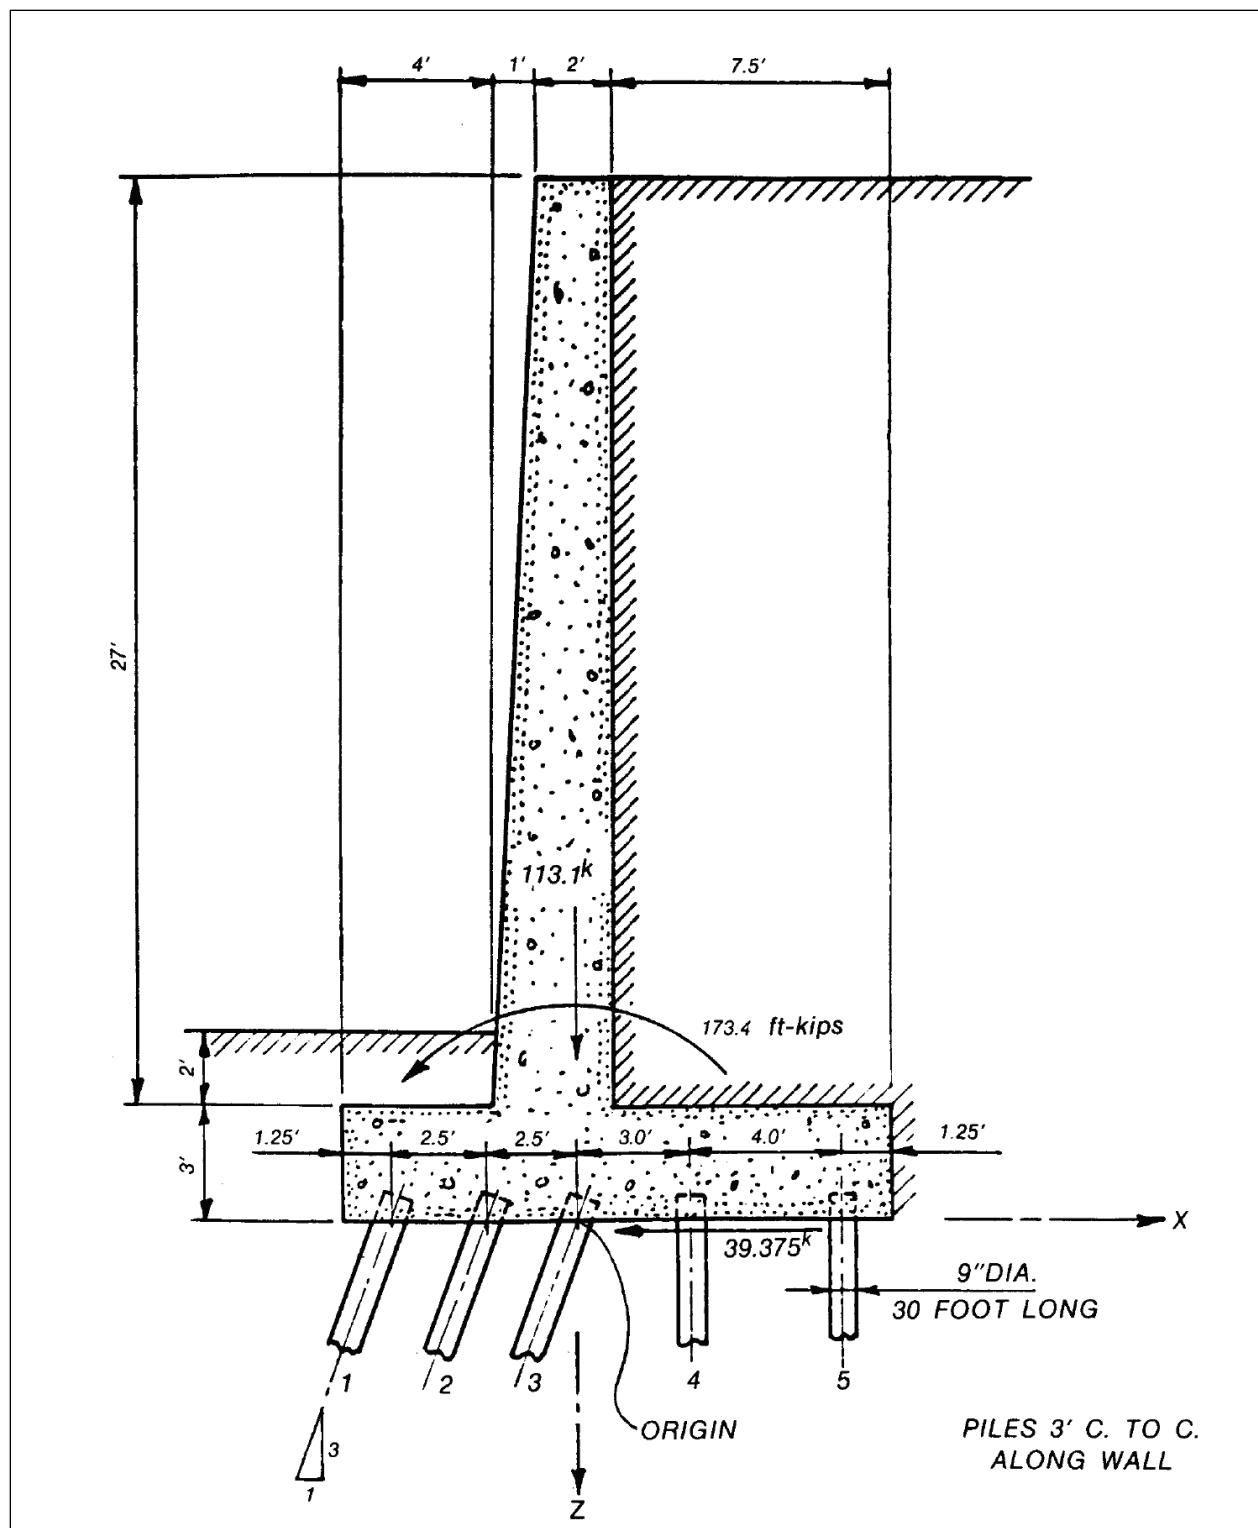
Cross-section viewing of an earth retaining wall founded on rows of batter pile groups 3 ft center-on-center along the retain wall (after Hartman et al. 1989)
